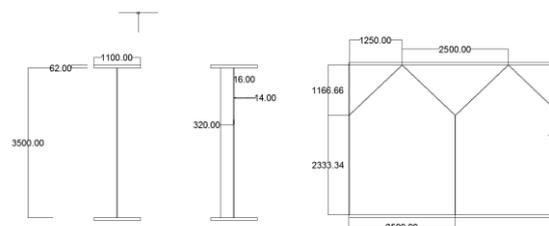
Cross section of the plate girder with pentagonal stiffener arrangement
